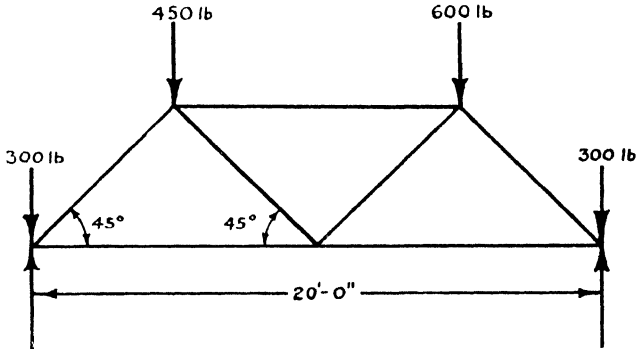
TWENTY-FOOT SPAN LATTICE GIRDER
